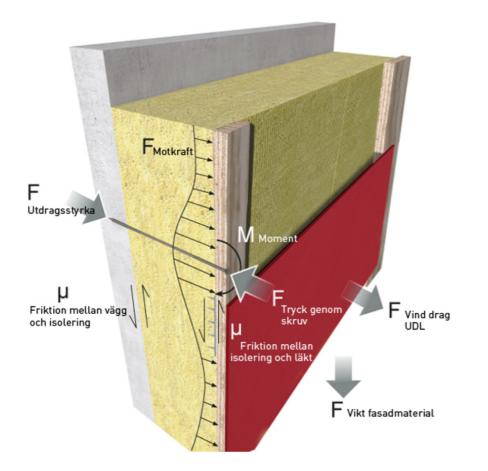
Rockwool REDAIR FLEX façade insulation system (source: Rockwool Sweden)
